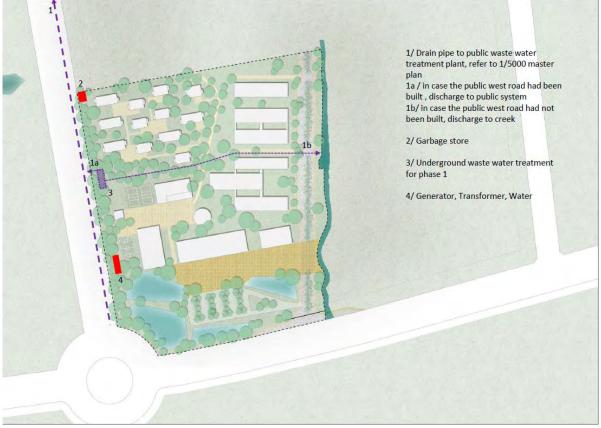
Location of Wastewater Treatment Plant and Waste Storage Area within the Project Site
